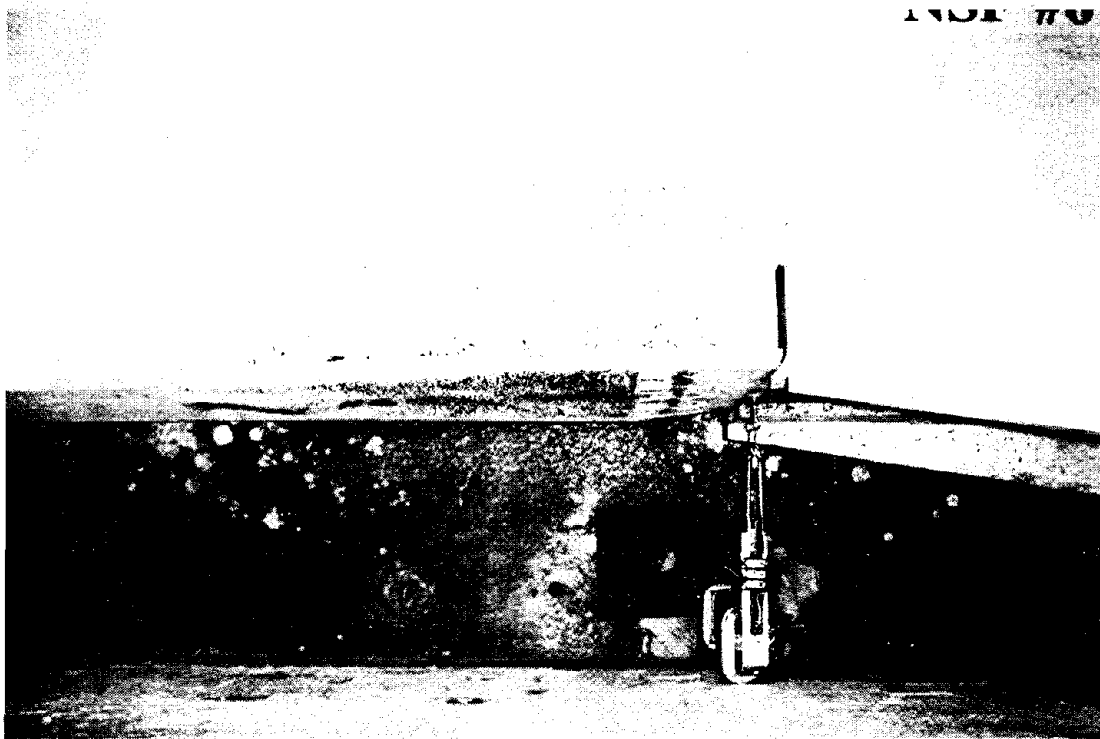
Buckling of Bottom Beam Flange and Web at 3-in. Displacement, Cycle 2
